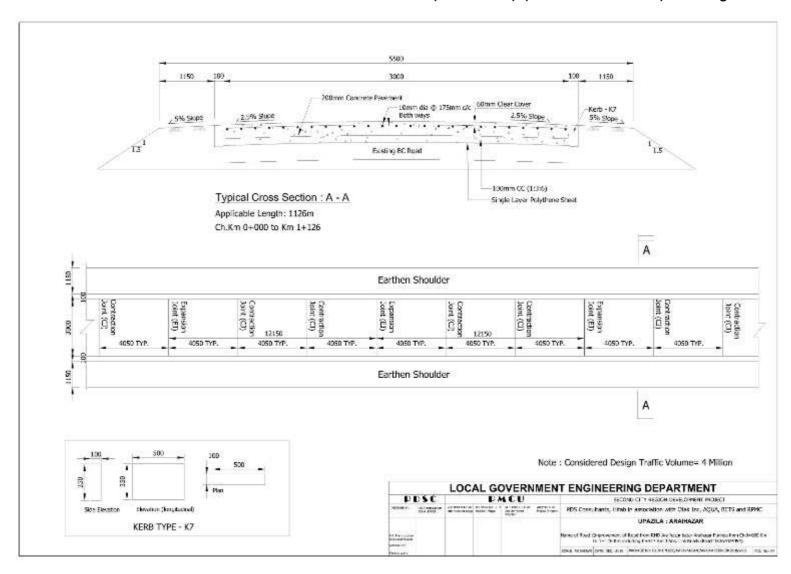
Cross section of Laskardi - Langardi Bazar road (Ch.0-2200m) (Road ID # 367024072)
